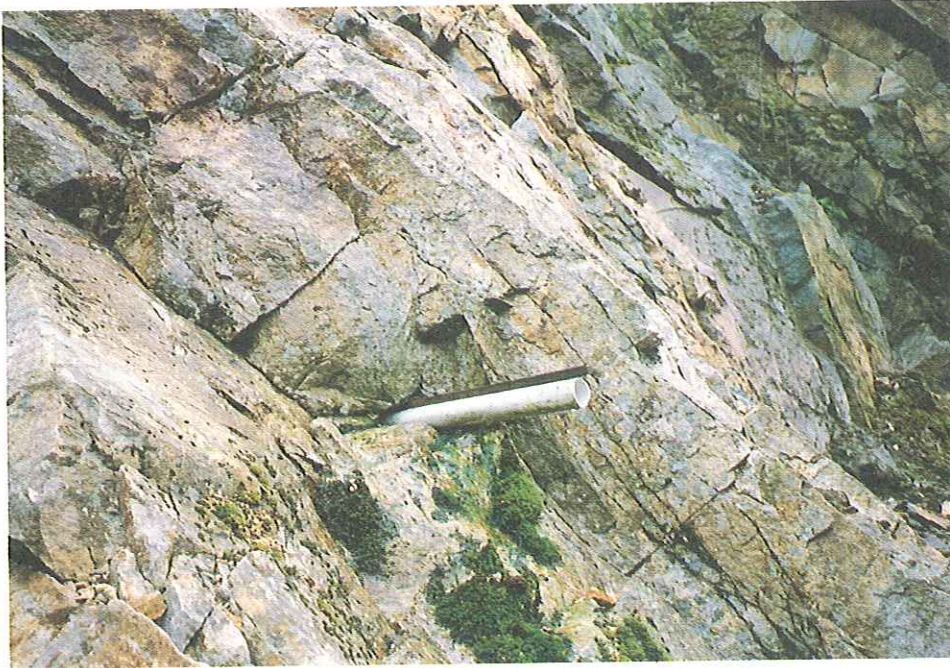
Drain holes with perforated casing installed in a rock slope. For rock cuts in excess of about 30 feet, such drains are recommended at every excavation level in the cut to reduce water pressures and freeze-thaw potential in the slope. This drain protrudes more than necessary.
